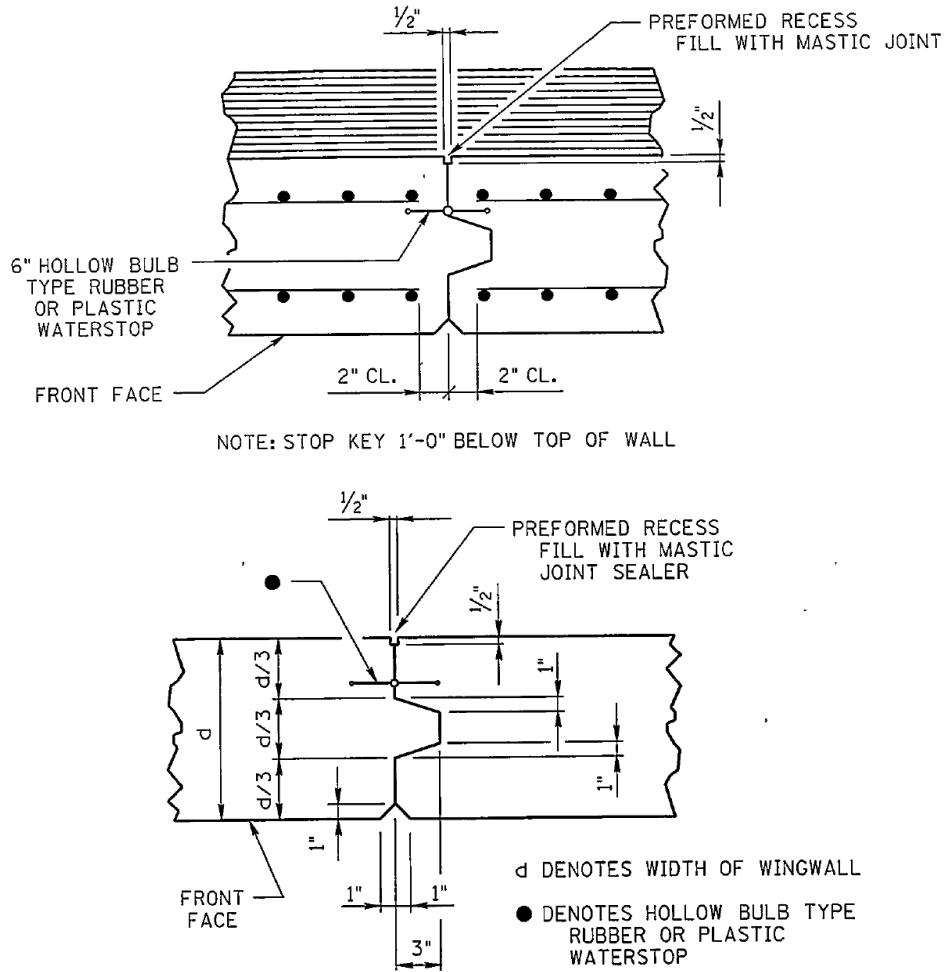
TDOT Wingwall Vertical Contraction Joint (TDOT 2000d)
